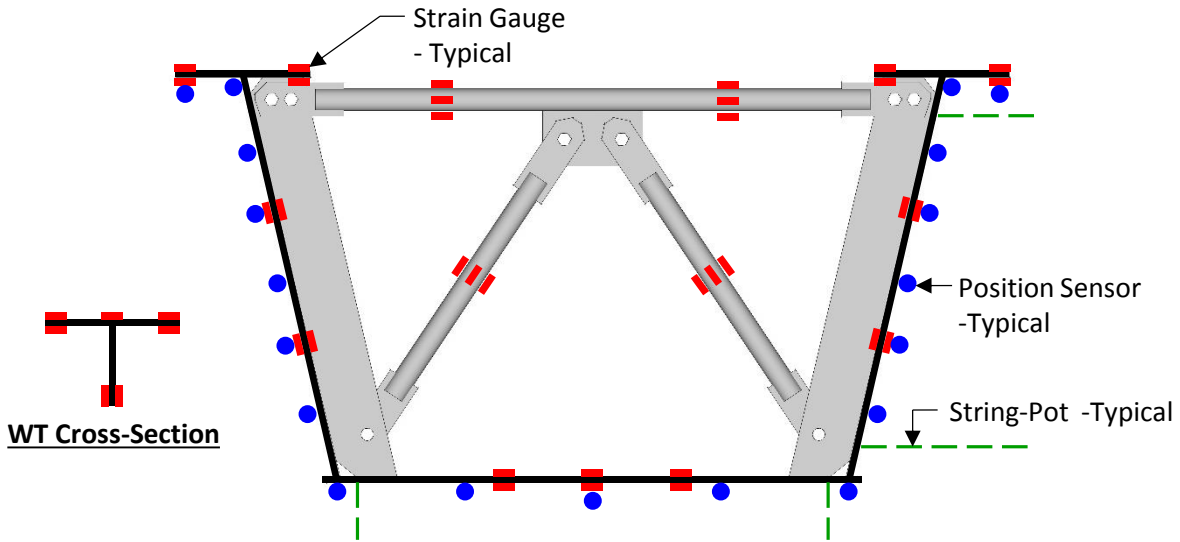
Instrumentation Layout on Tub Girder Cross-Section
